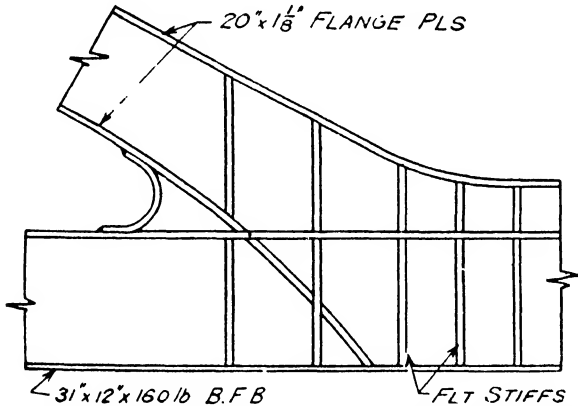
DETAIL AT ABUTMENT OF PORTAL FRAME GIRDER
